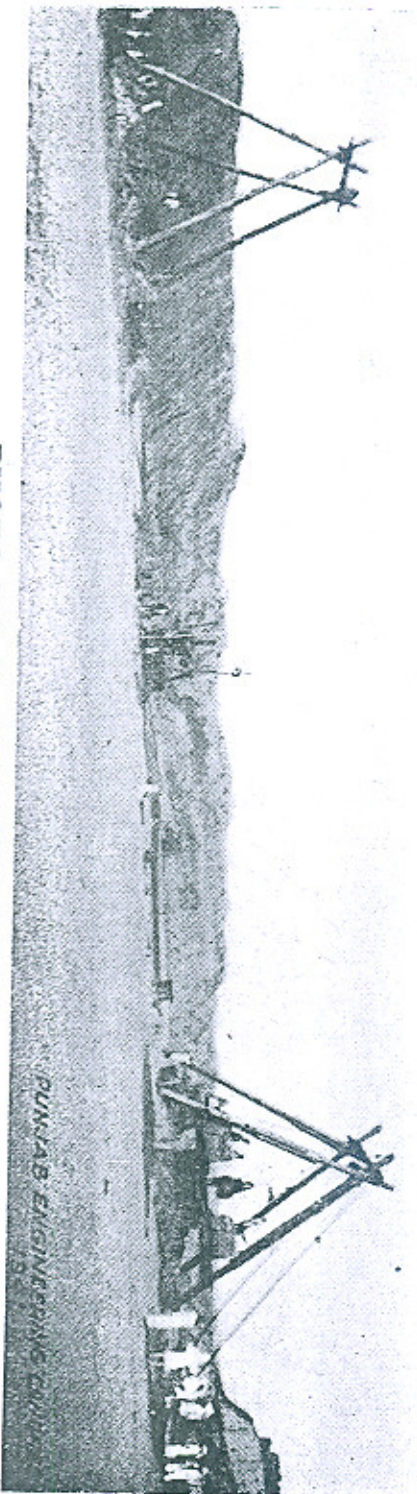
DHOKPATHAN BRIDGE.
